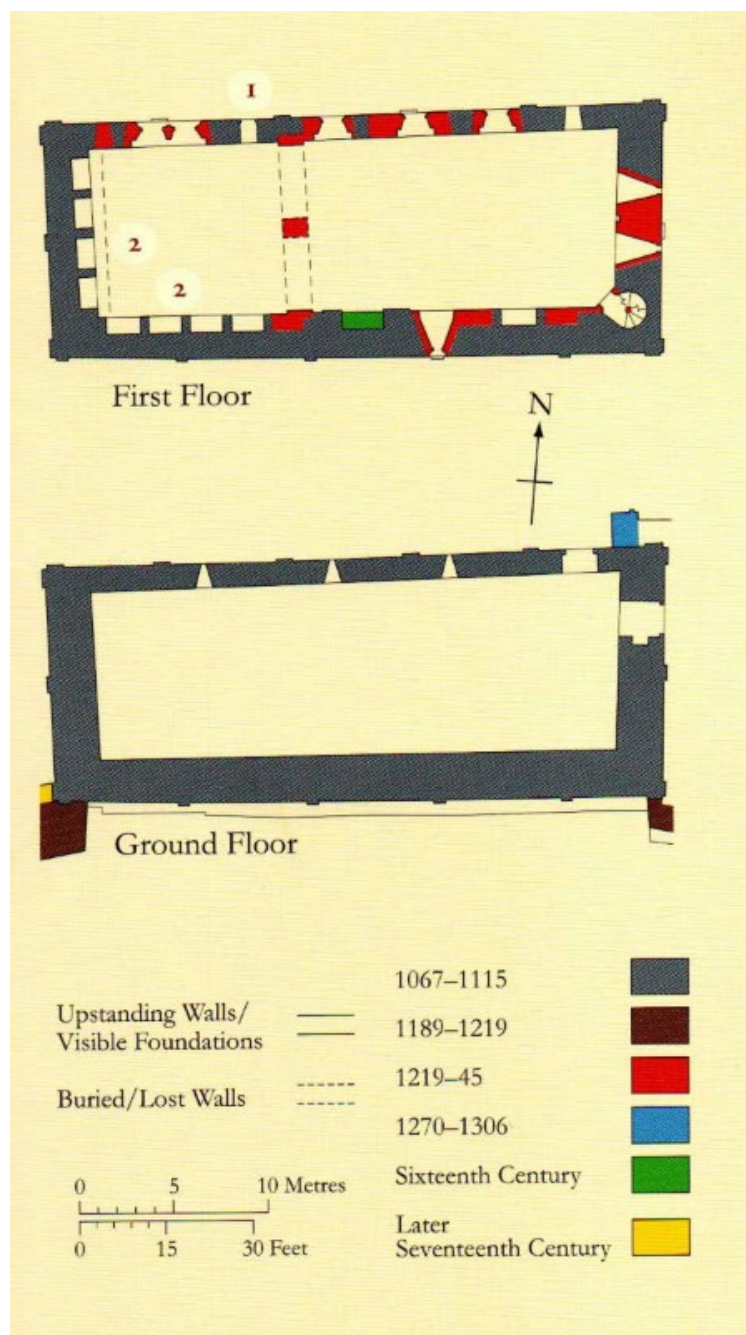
The ground floor and first floor of Chepstow Castle, Wales. Image via Goodall, 2011.
